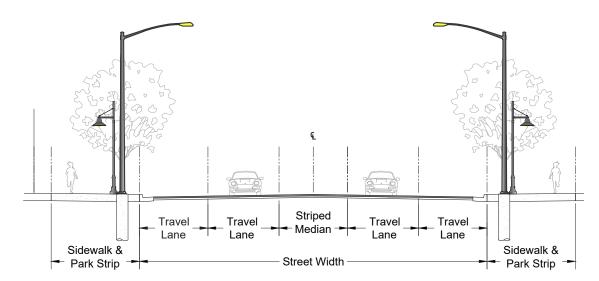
Typical Collector with Continuous Street and Non-Continuous Pedestrian Lighting Cross Section
